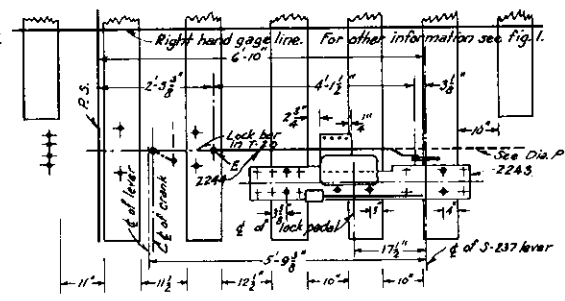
R.H. LAYOUT 18 FT. SWITCH RAIL - 3 HOLE 130 LB. RAIL.
